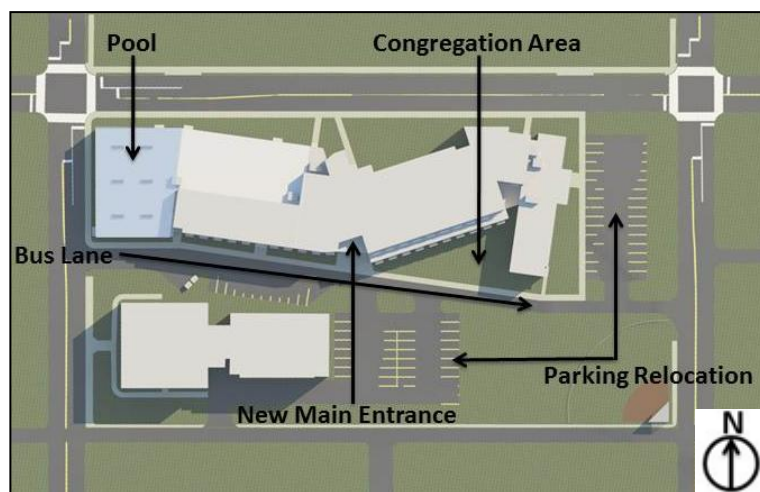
Nexus' Revised Campus Plan (building moved east, parking reallocated, and pool addition)
